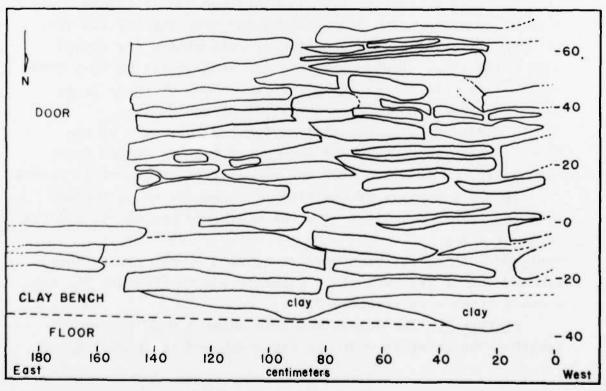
Profile of interior of south wall of dugout at Site 41KX66.
